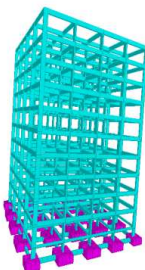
3D view of the RC framed structure with SF (all dimensions in m)
